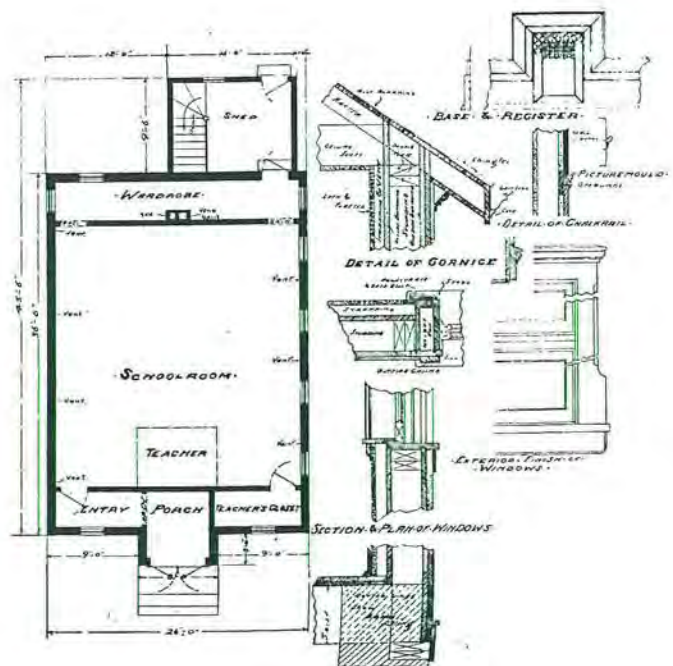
Design for Frame School Building, No. 2, 1903, showing the plan and critical construction details. (*The Western School Journal*, 1906, p. 204)
